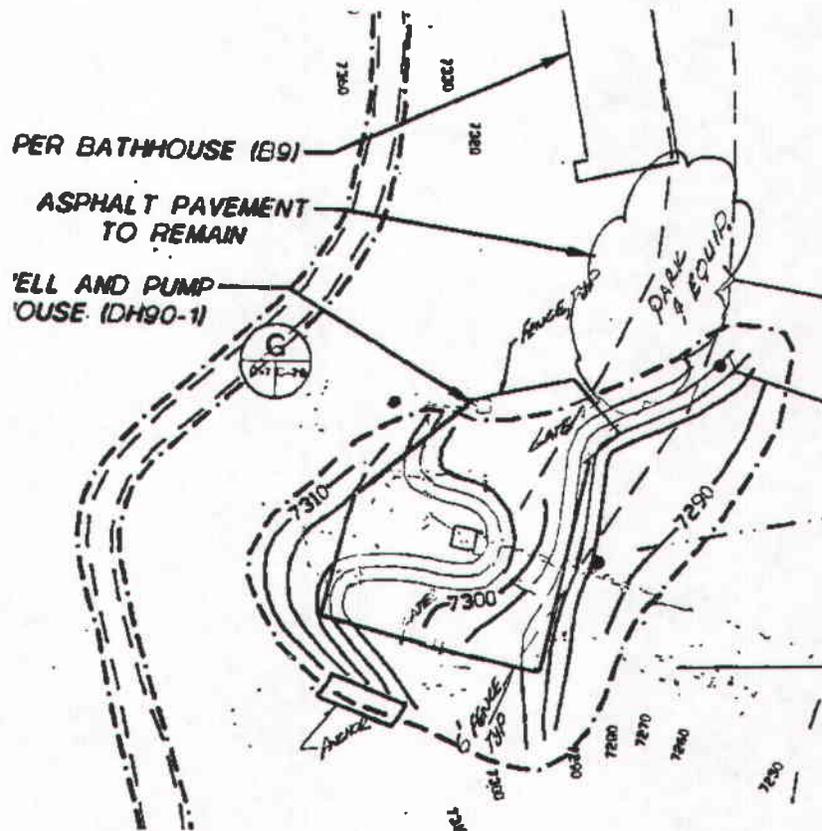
General Site Location; Proposed fence line centered on cap, site north up.
